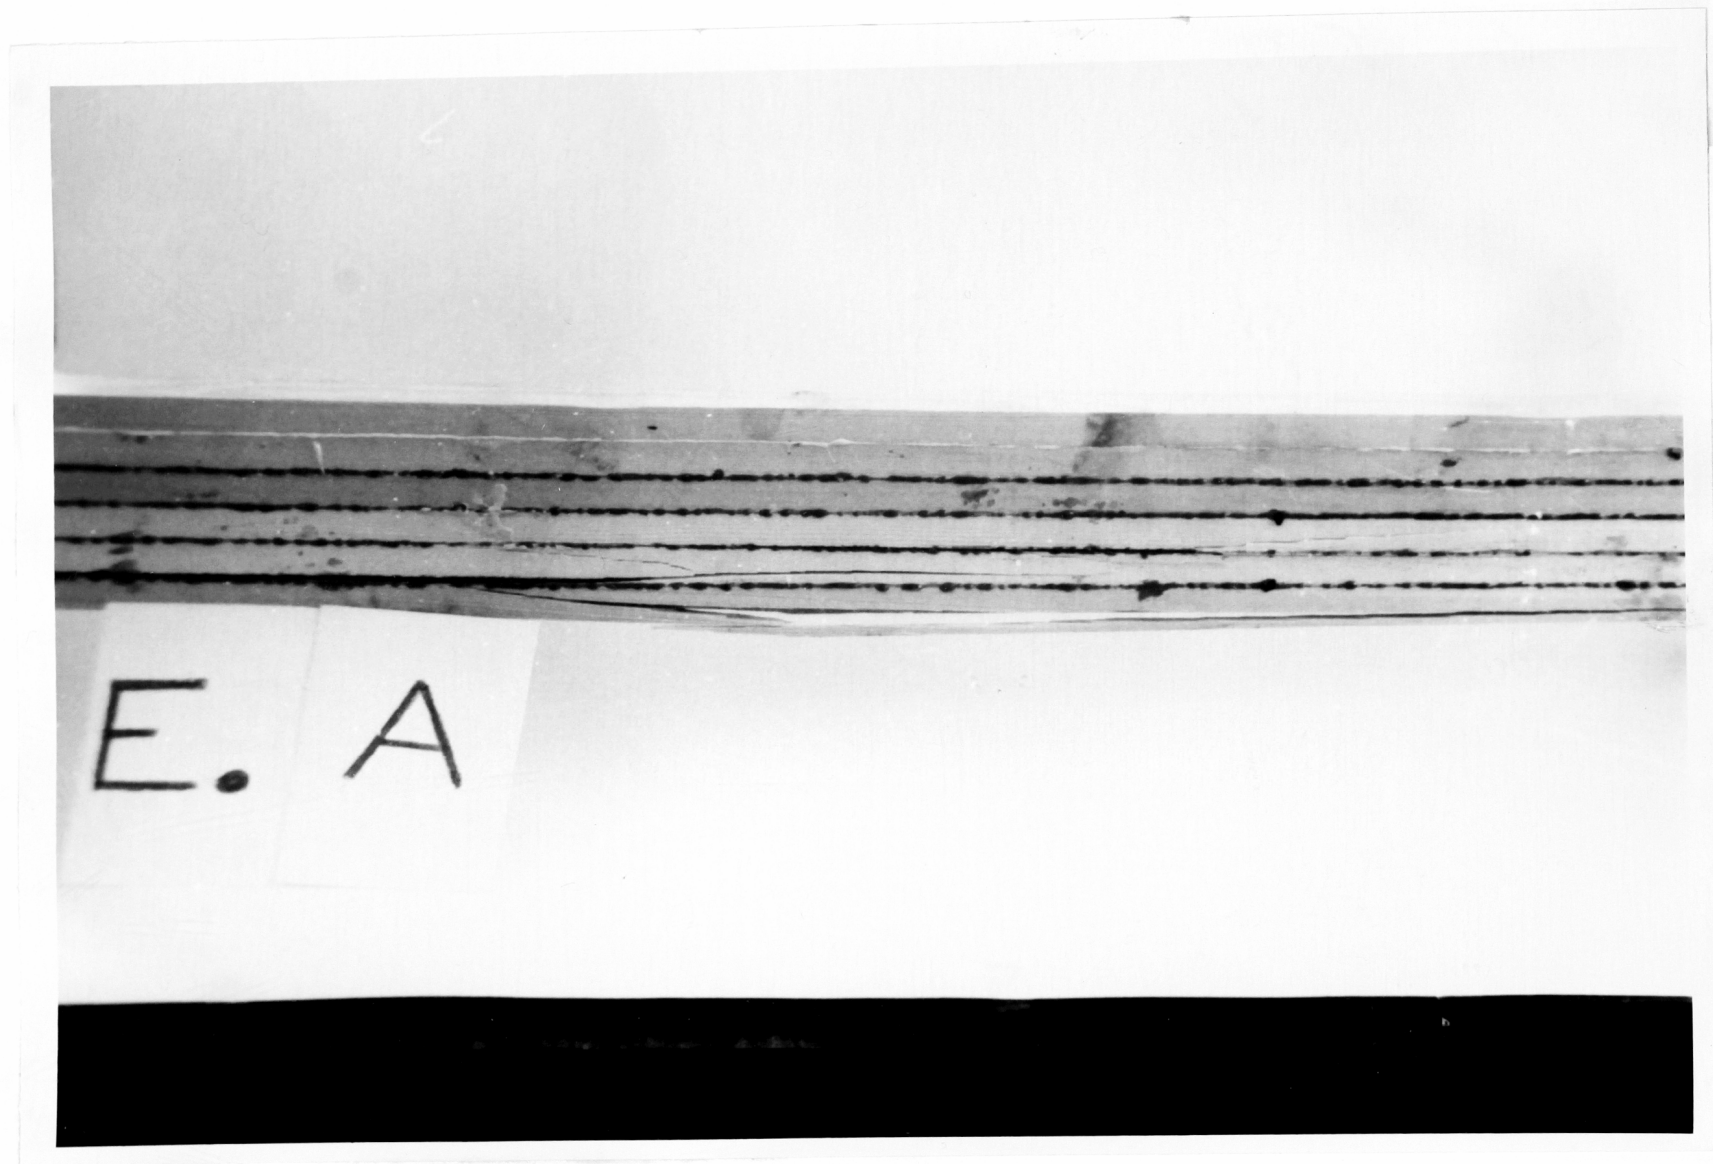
FIGURE VII TYPICAL FAILURE OF THE EPOXY CONTROL BEAMS, TYPE A
